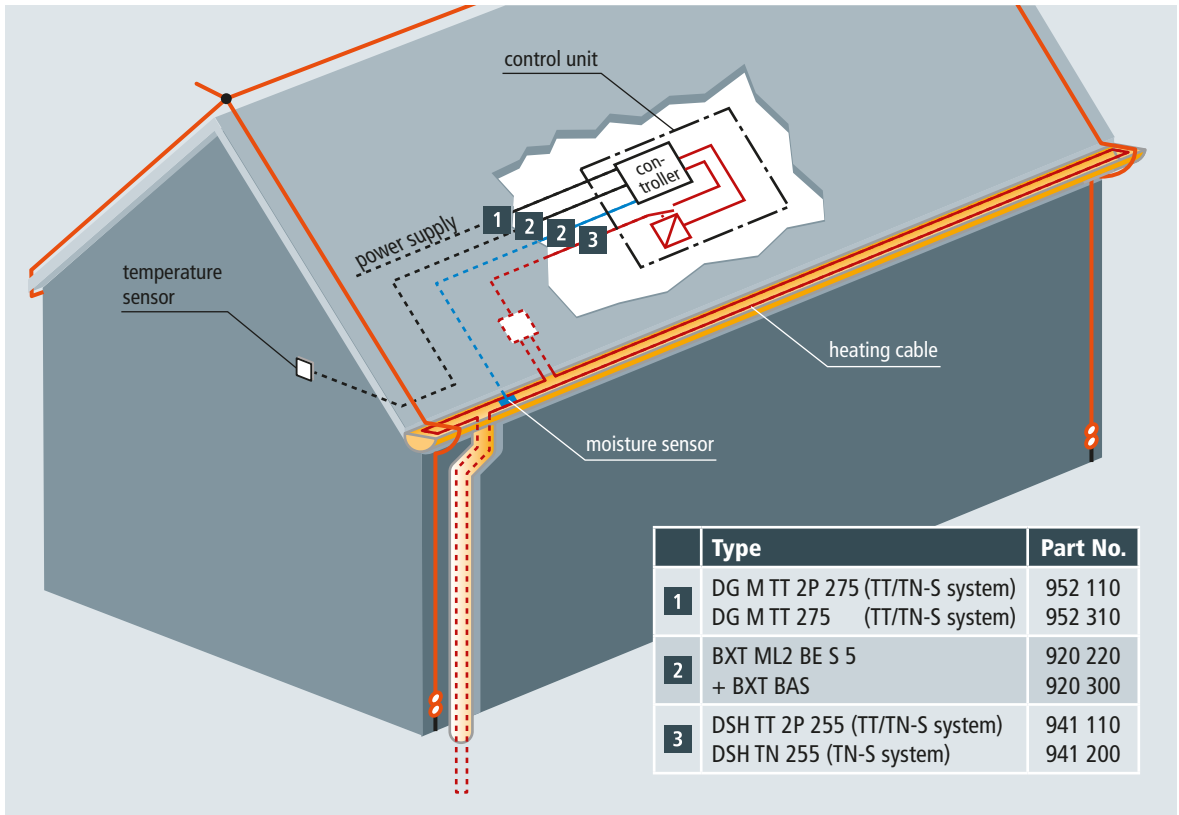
Installation of lightning current and surge arresters if the control unit is located far from the entry point into a structure with external lightning protection system
